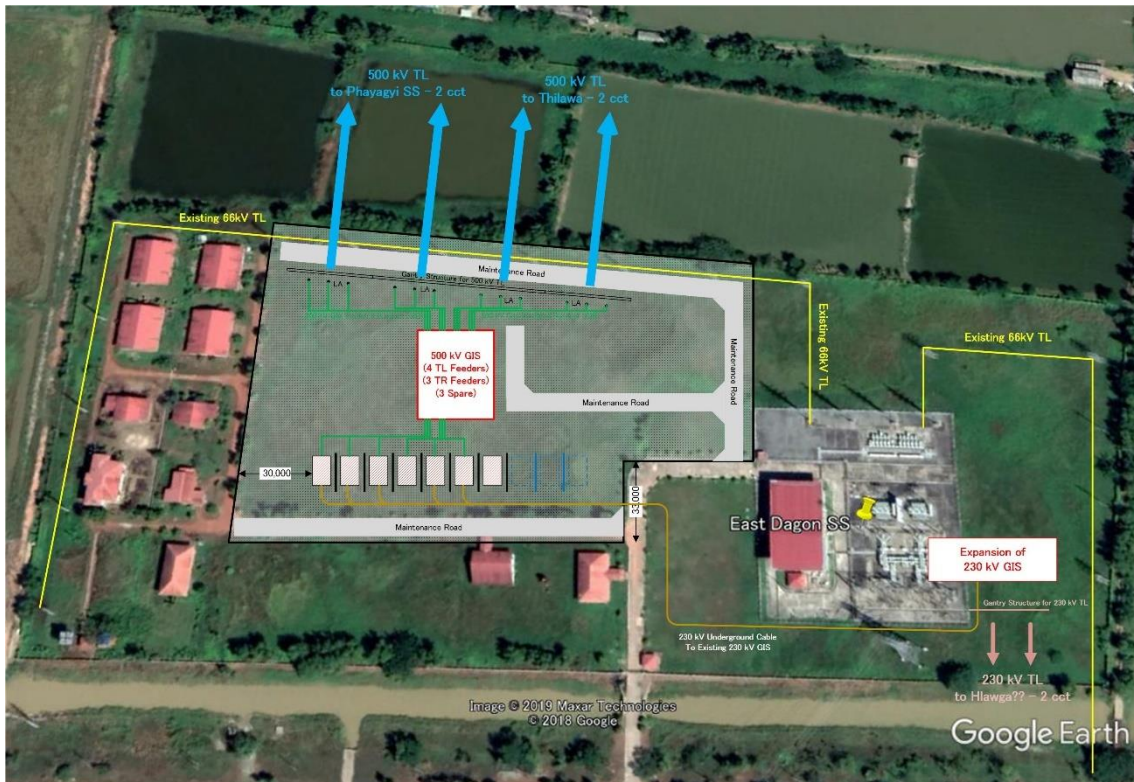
Arrangement of 500 kV Facilities in Existing East Dagon Substation
